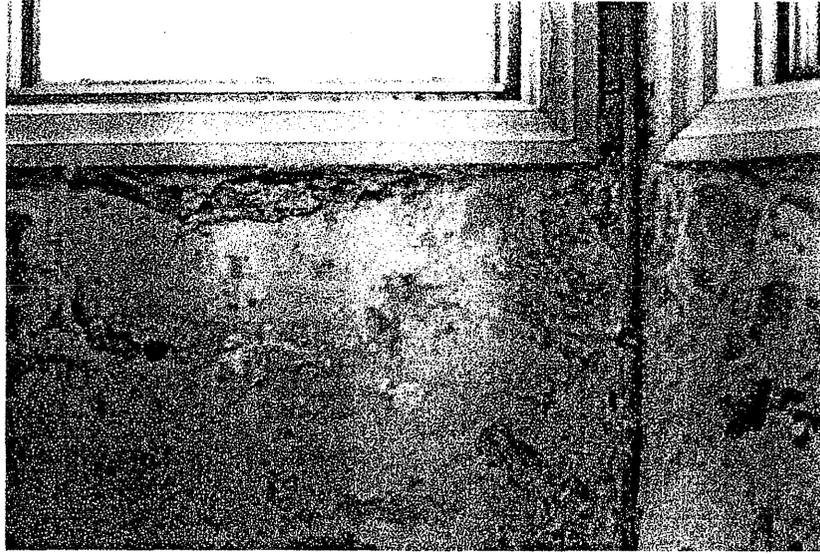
Third floor window. Unsealed joints allow windows to take on water, damaging plaster.
